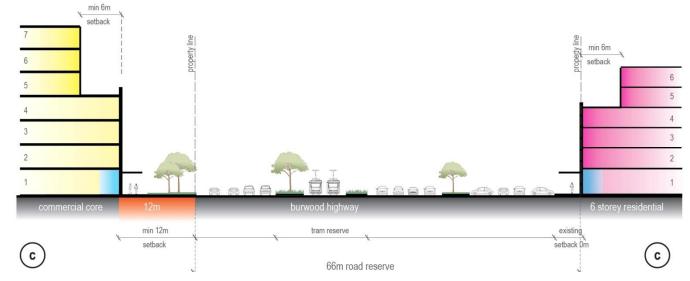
Section Diagram Commercial Core and Burwood Highway South Interface (Section c)
